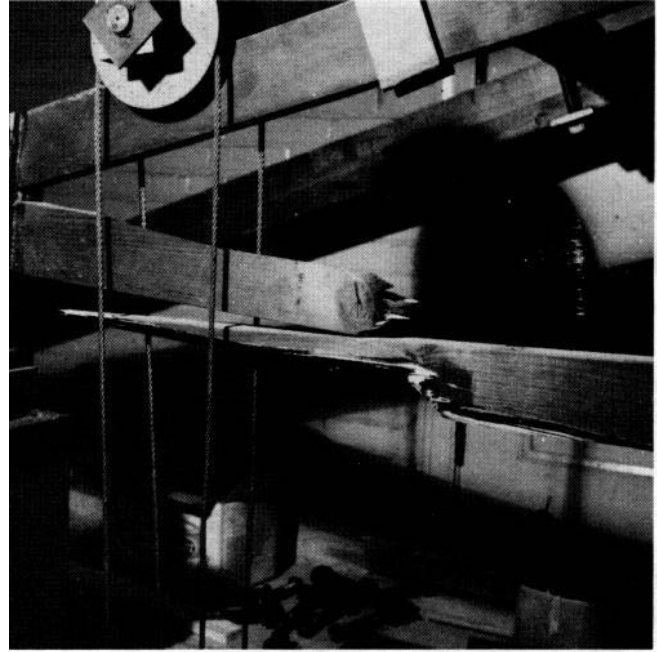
Failure of 10-year-old phenol-resorcinol "B" glued plywood gusset trussed rafter in tension in the lower chord. (M145840-7)
